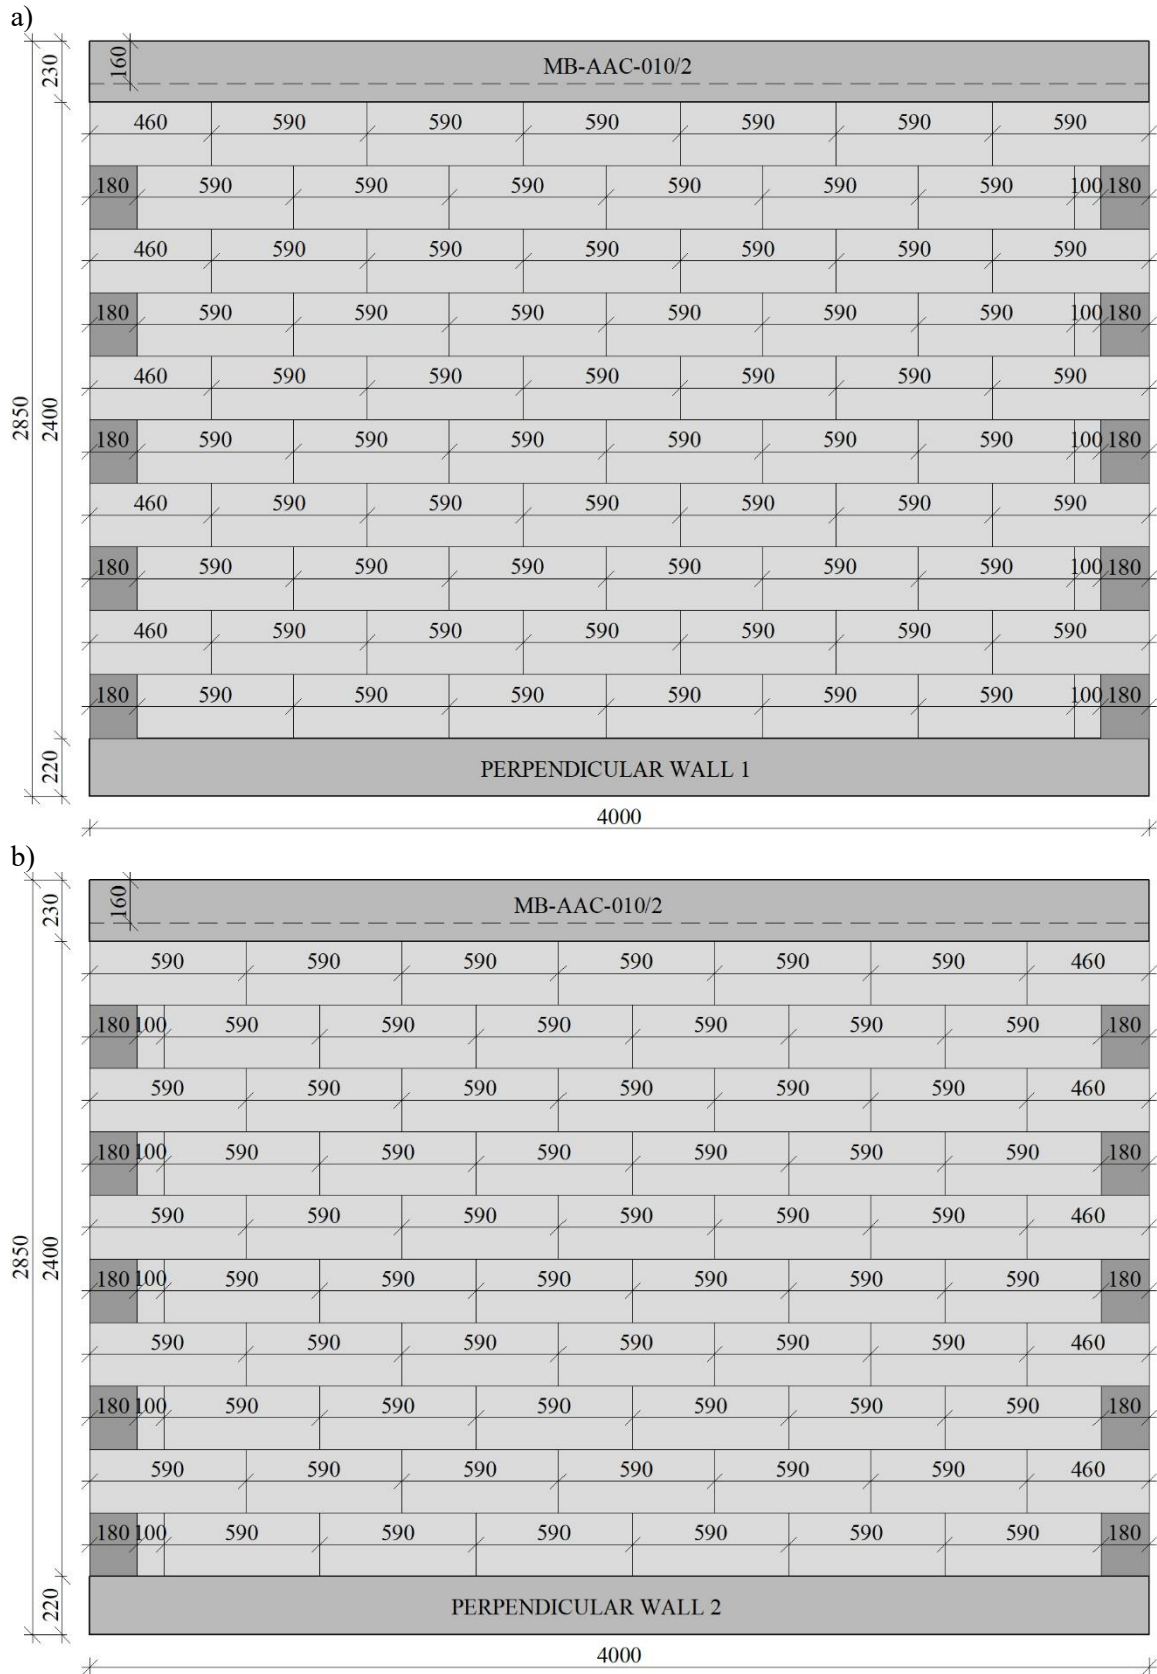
Design of the MB-AAC-010/2 model: a) perpendicular wall 1, b) perpendicular wall 2
